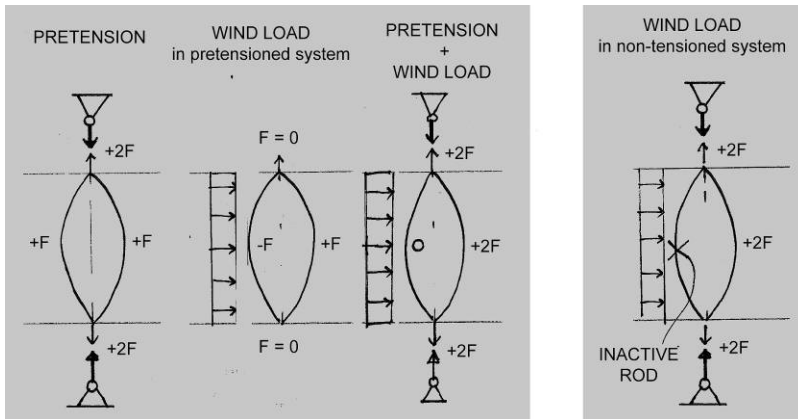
Pretensioned truss with wind load vs. a non-pretensioned tension truss.
